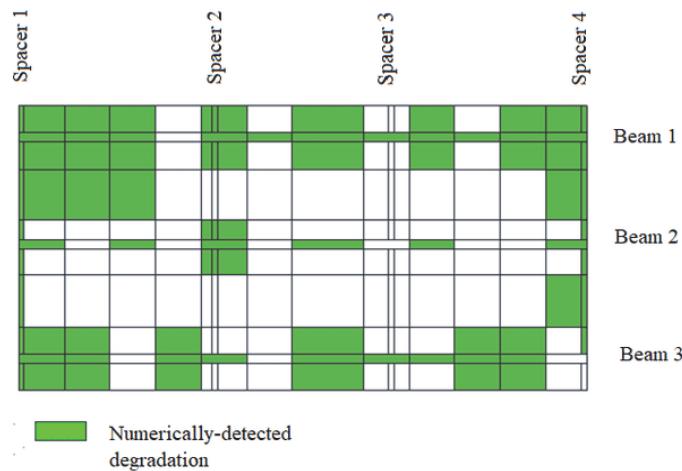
Plan view of the bridge with details of numerically recorded damage.
